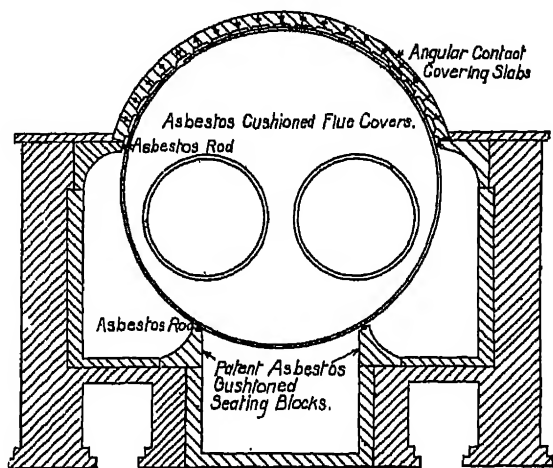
Boiler Setting with Asbestos-cushioned Seating Blocks and Asbestos-cushioned Flue Covers
